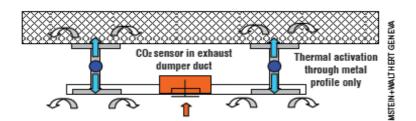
Ceiling panel for heating and cooling, with integrated extract air terminal /7, p. 60/.
